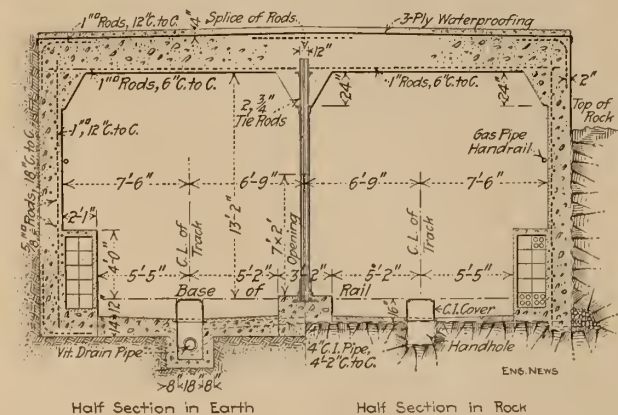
REINFORCED-CONCRETE SUBWAY ON LEXINGTON AVE.
